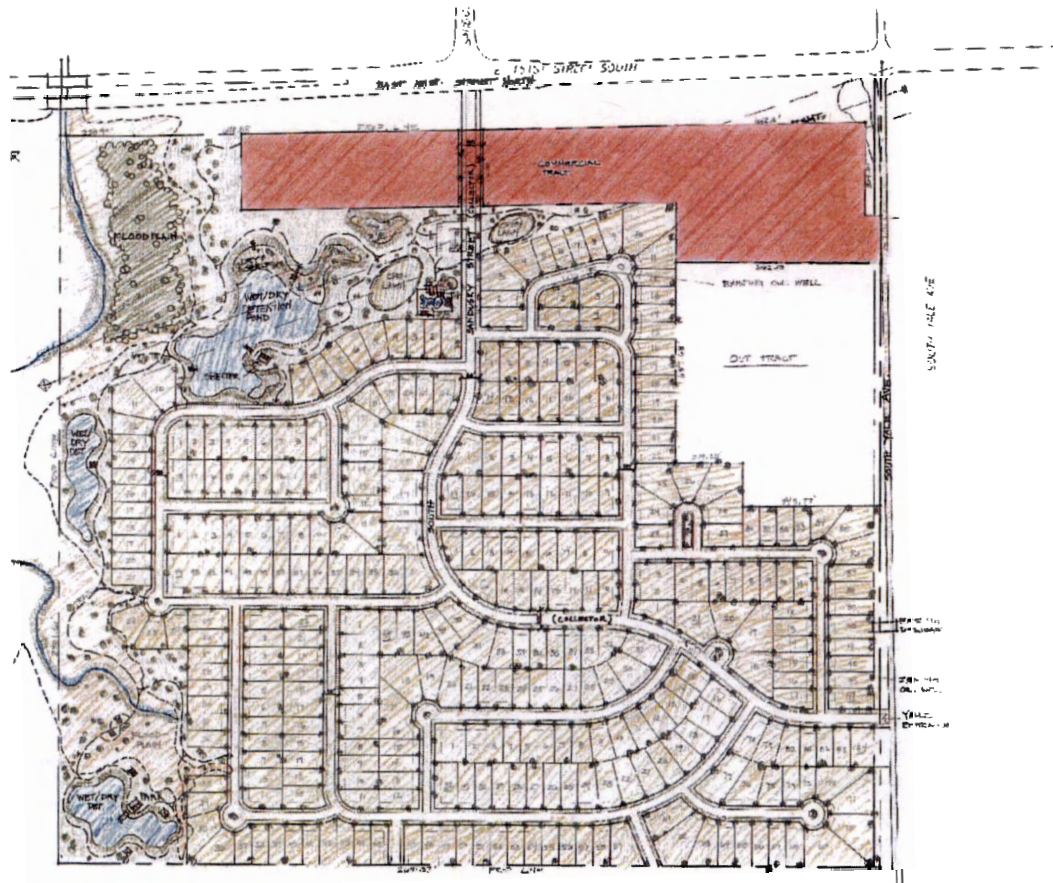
EXHIBIT D: PROPOSED CONCEPTUAL SITE PLAN
